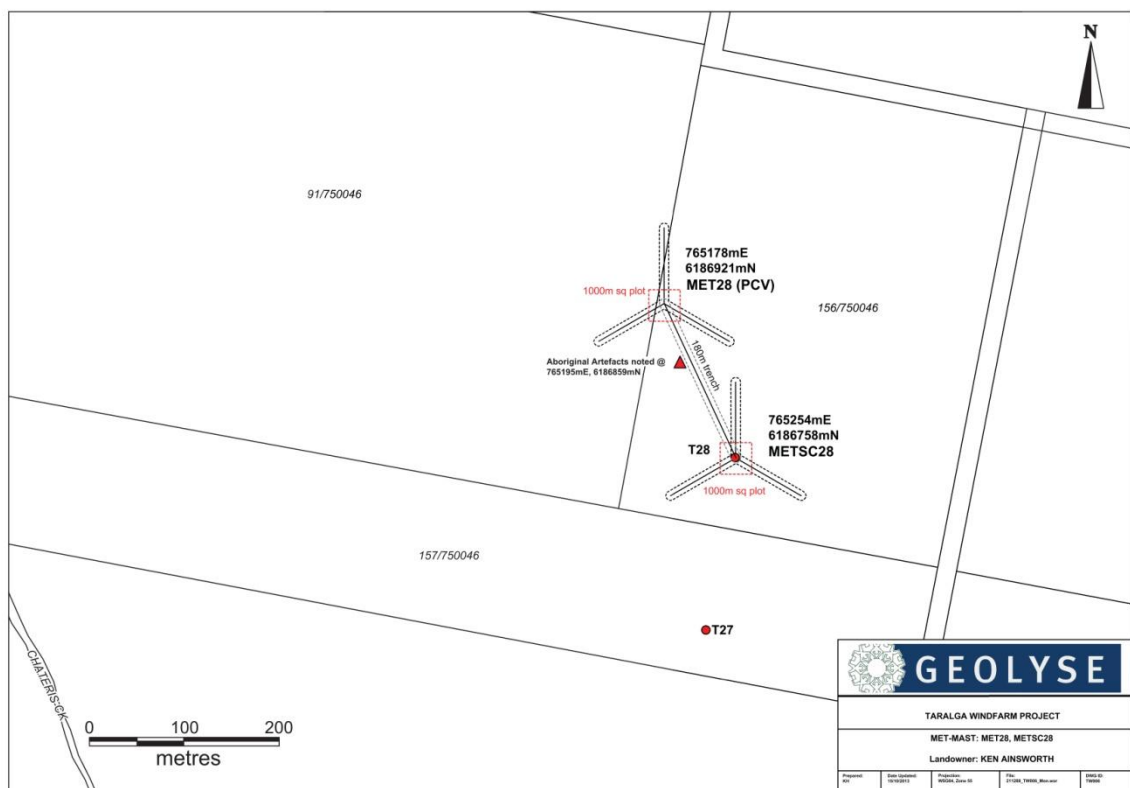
Plan of the proposed works at met-mast #MET28 and proposed trench to Turbine 28; note also location of Aboriginal artefacts found during assessment.
